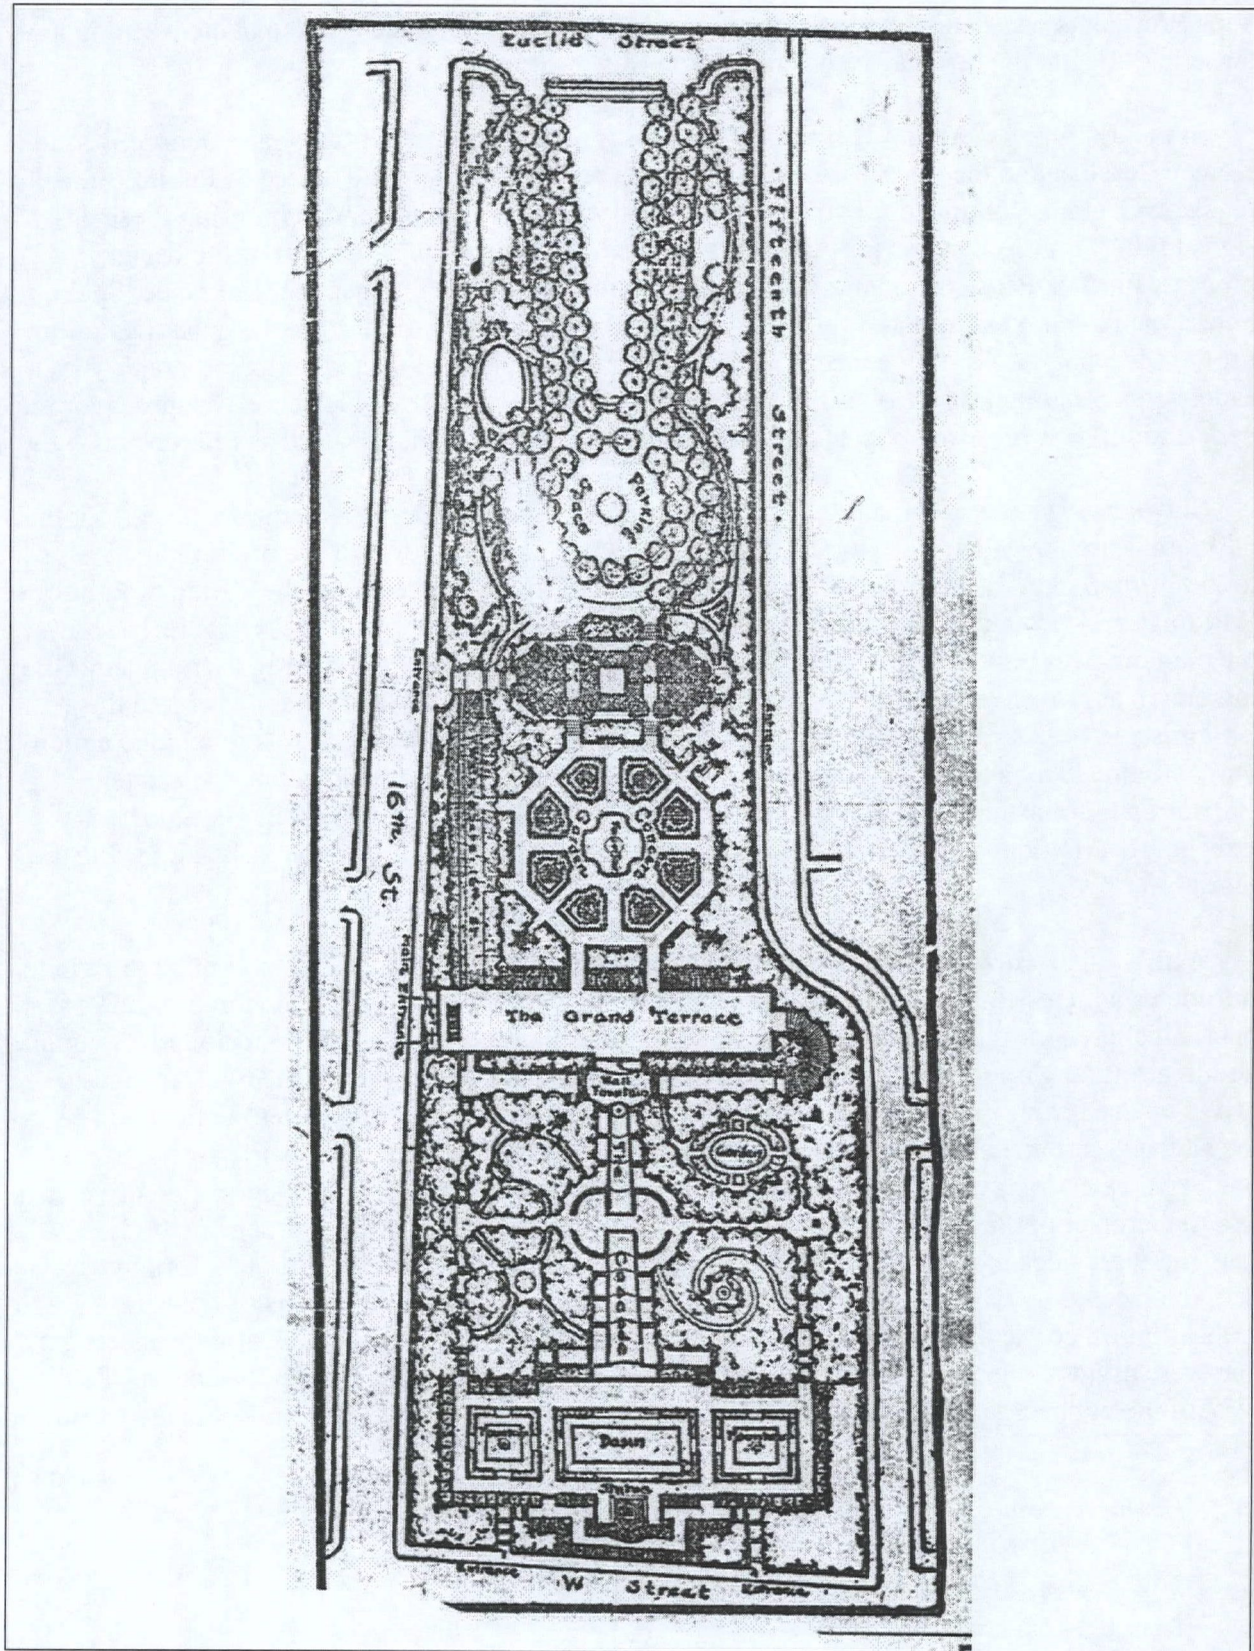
Photo of plan for Meridian Hill Park, circa 1914, in a newspaper article.5-16. North is to the top of the plan (Washington Star, Nov. 7, 191?, RCP-CRF). Note: What is identified in this plan as the "Grand Terrace" is later called the "Great Terrace." Note also the subtle shift in the main north/south axis to respond to the irregular shape of the site.
